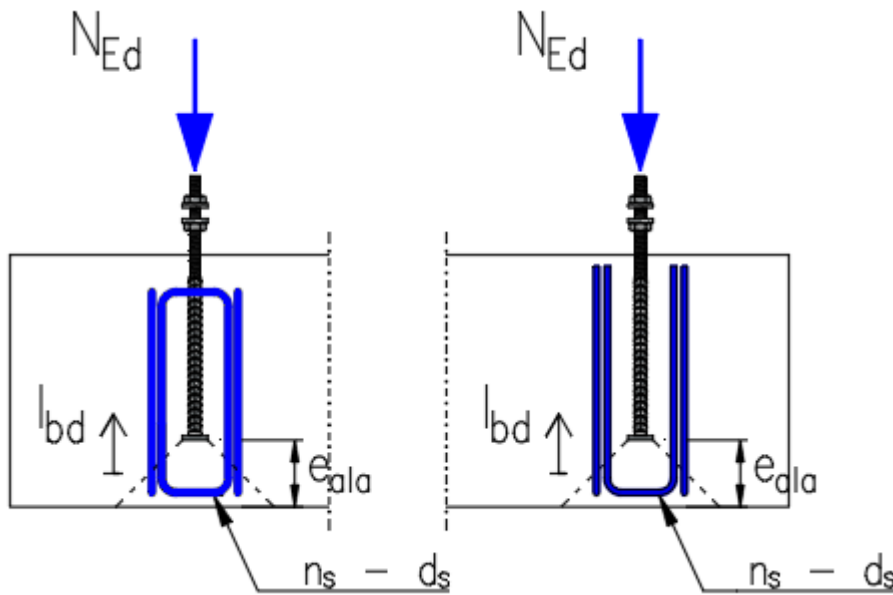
Reinforcement and distance from bottom for compressed SUJ/L bolts
